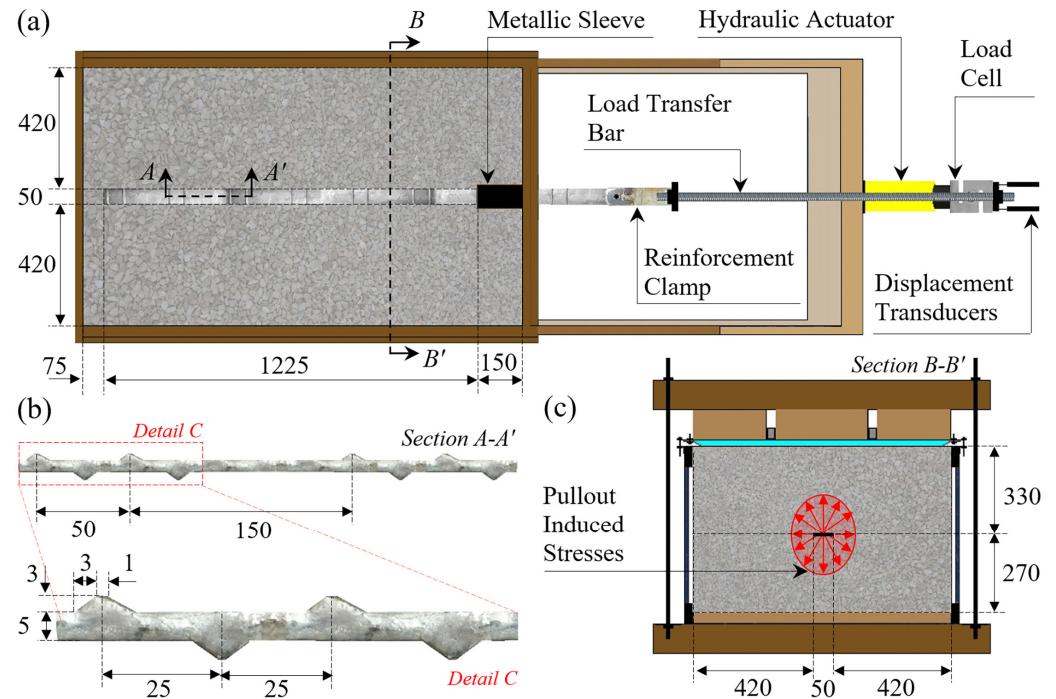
Pullout device details (in millimeters): (a) reinforcement arrangement and instrument positioning, (b) reinforcement geometry and dimensions of transverse ribs, and (c) vertical cross-section illustrating stresses induced by pullout.
